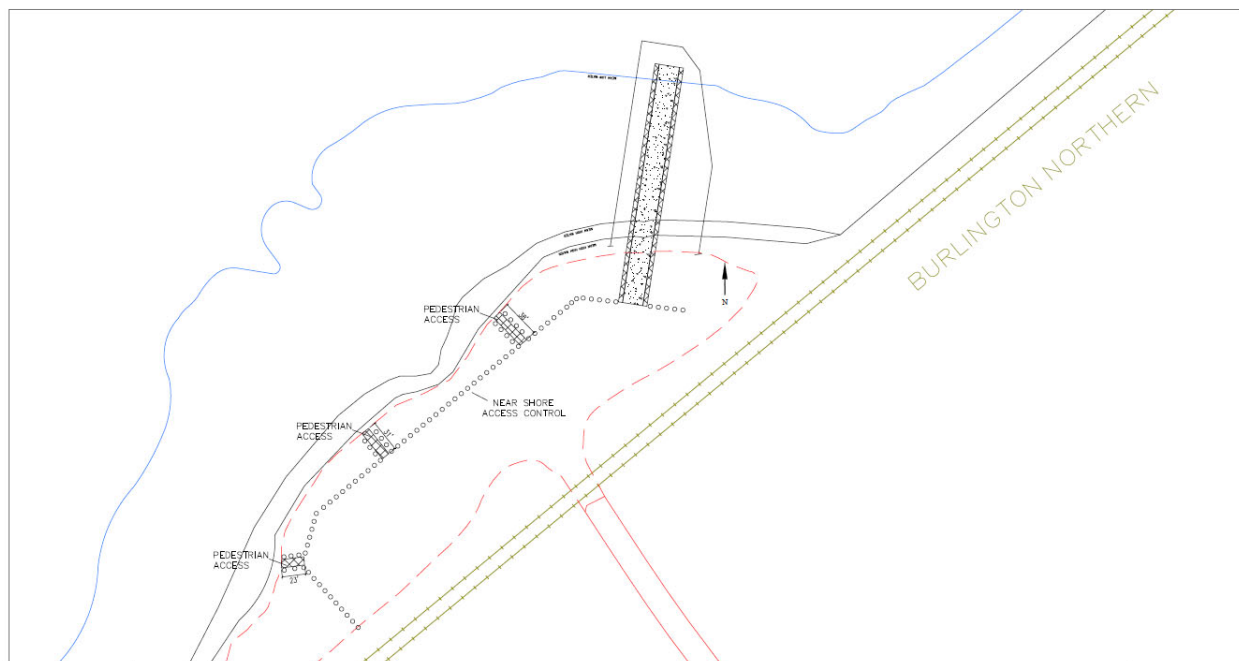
Plan view depicting the location of the proposed boat ramp and nearshore access control.
